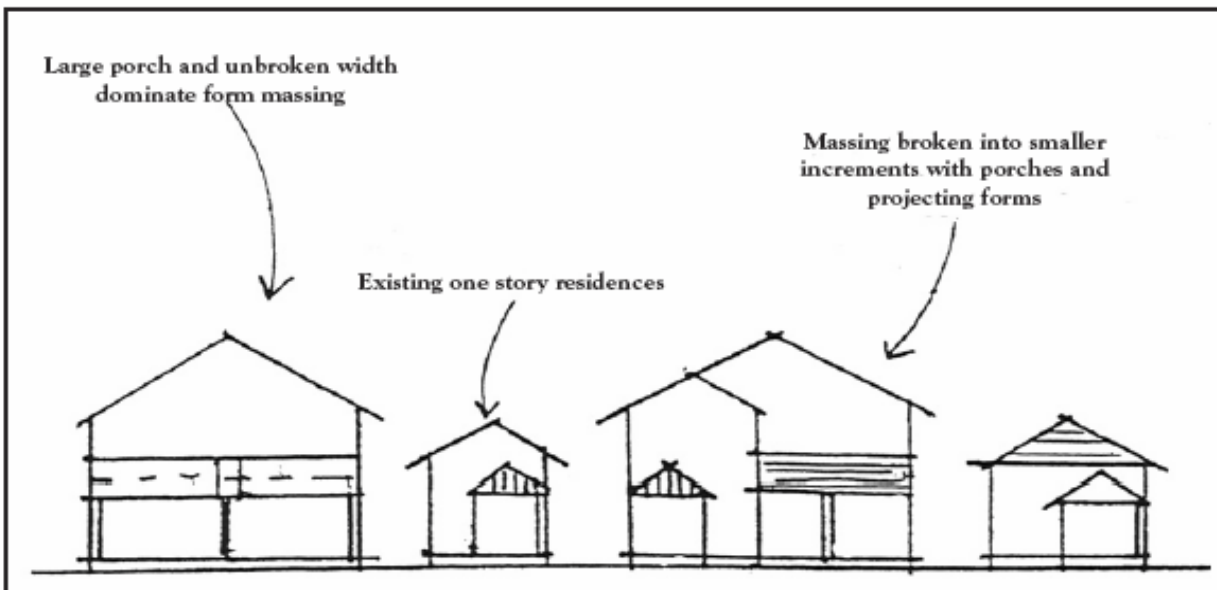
Create visual linkages. Offset building walls and roof lines. Incorporate similar roof forms and smaller design elements. (Note: The intent of this drawing is not to indicate that full-length porches are not acceptable for multi-family dwellings, but that design features must be considered along with overall form and massing to achieve compatibility.)
